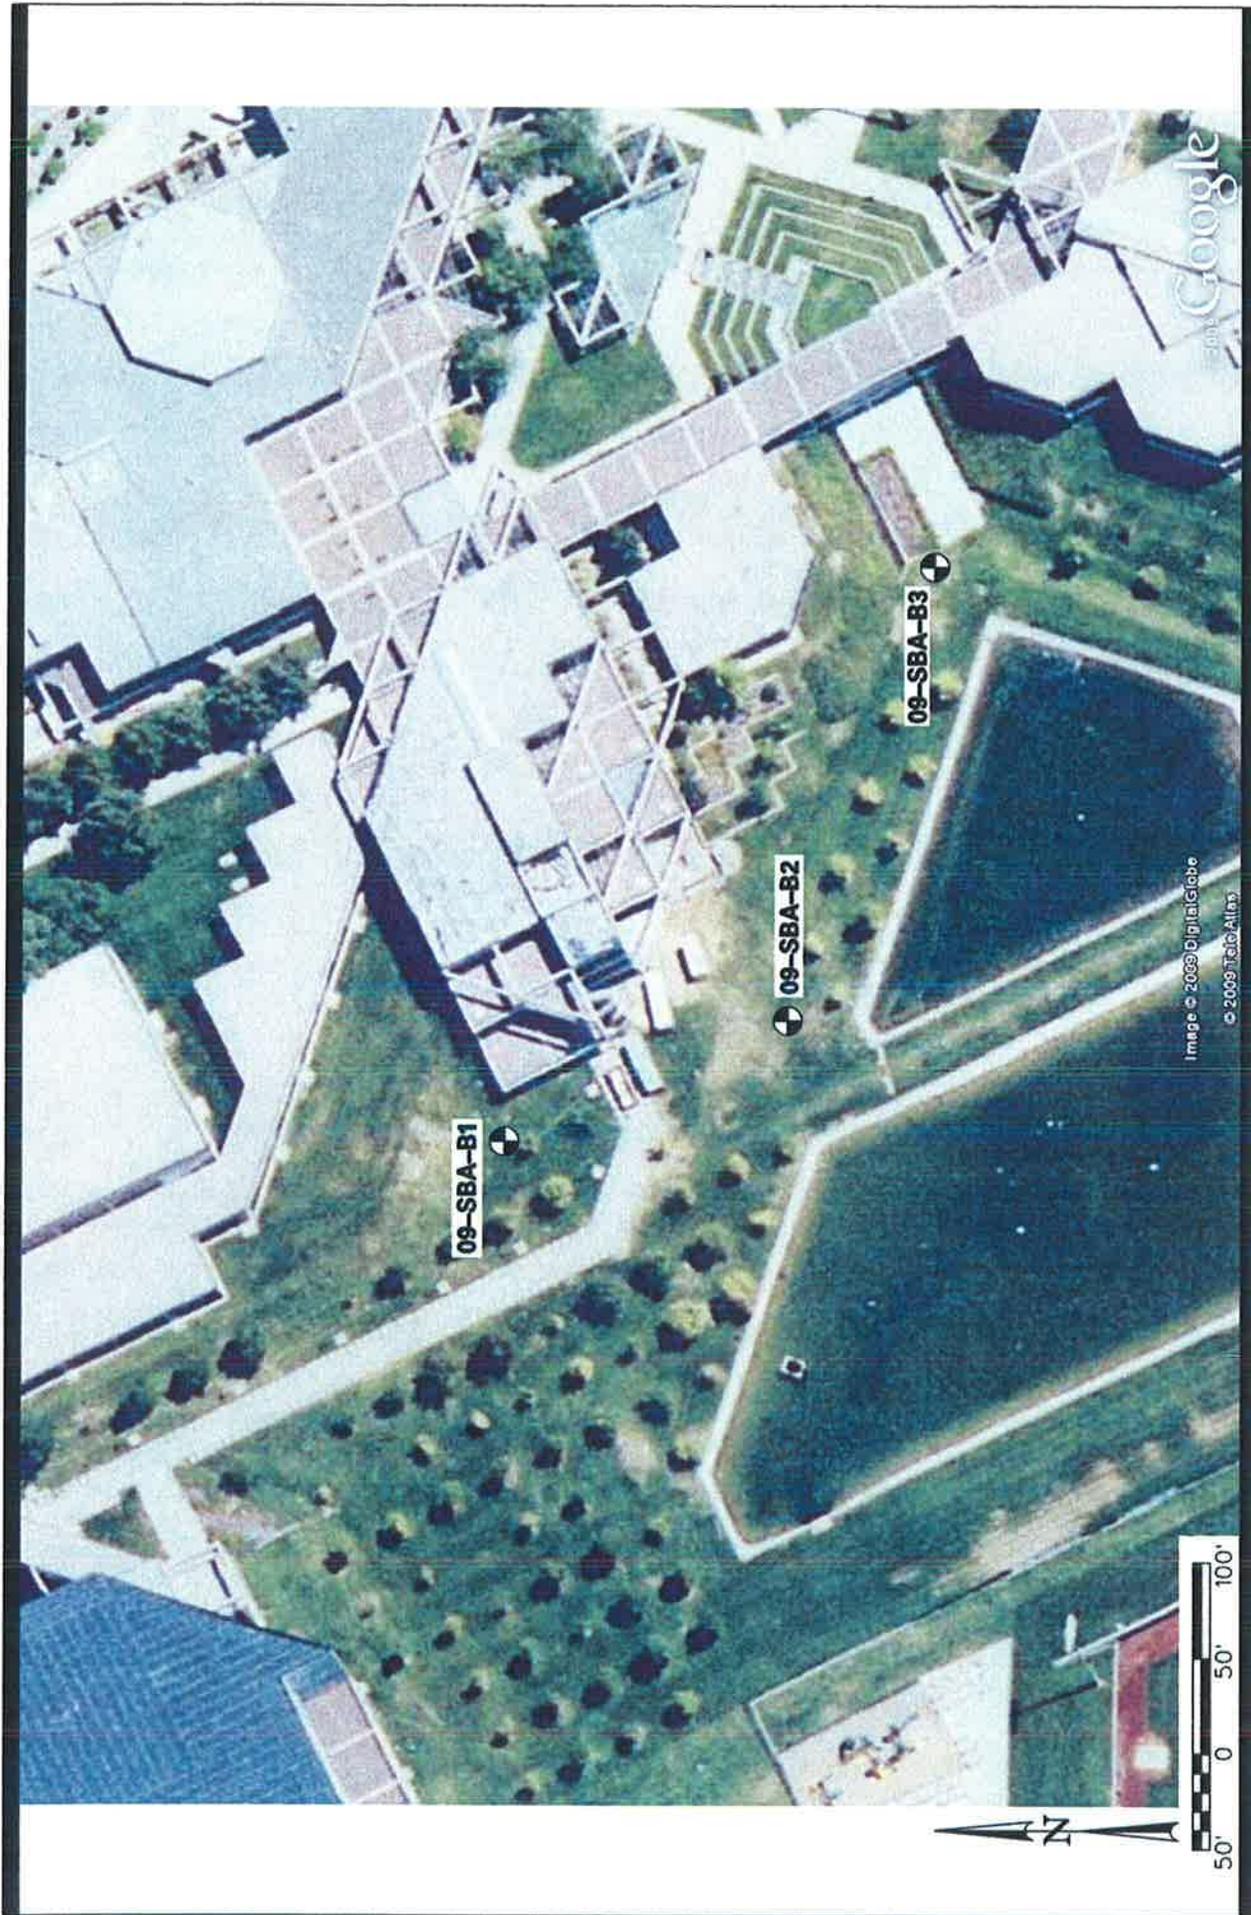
SITE PLAN & TEST HOLE LOCATIONS
